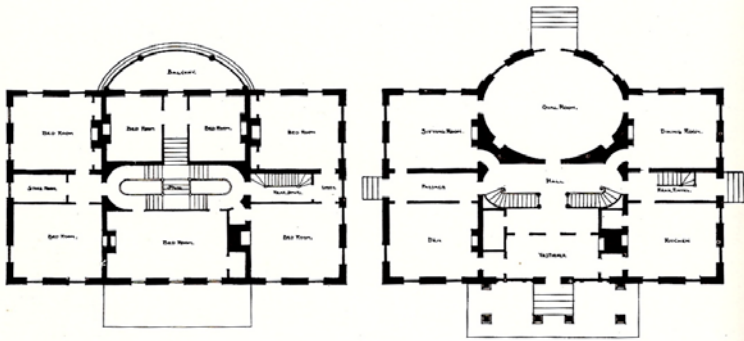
Floorplan of the Barrel House exhibiting cubical, symmetrical plan with an oval room (parlor) (adapted from Kimball 1966:160).
